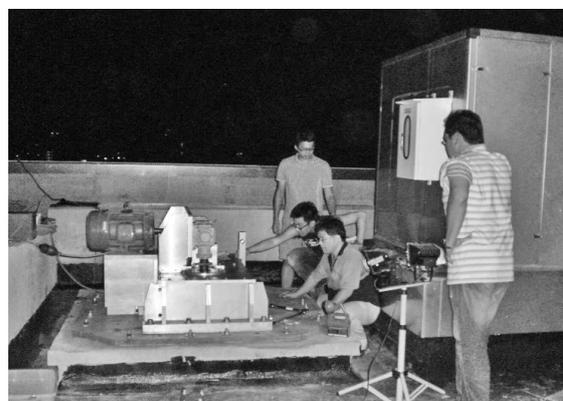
Ambient and forced vibration tests (Photo; S. J. Wang)
